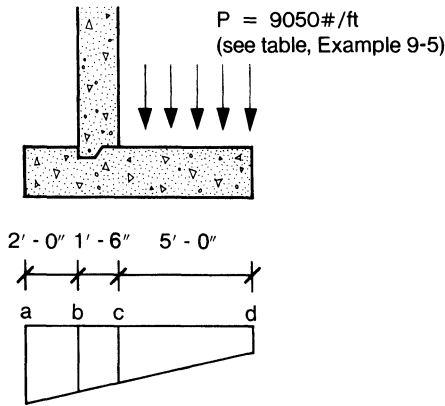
Example 11-12—Moment induced into footing of the cantilever retaining wall.
